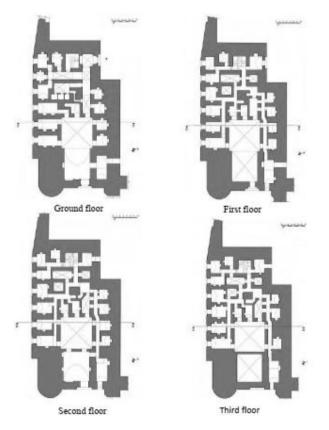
Hanafiyah Madrasa, floor plans (Source, Al-Harithy, 2007)
